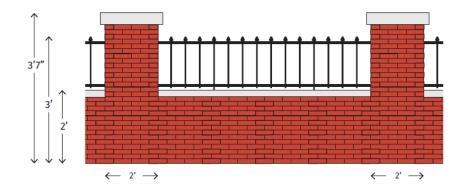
3 Foot Wall/Fence Along SW Stafford Road
